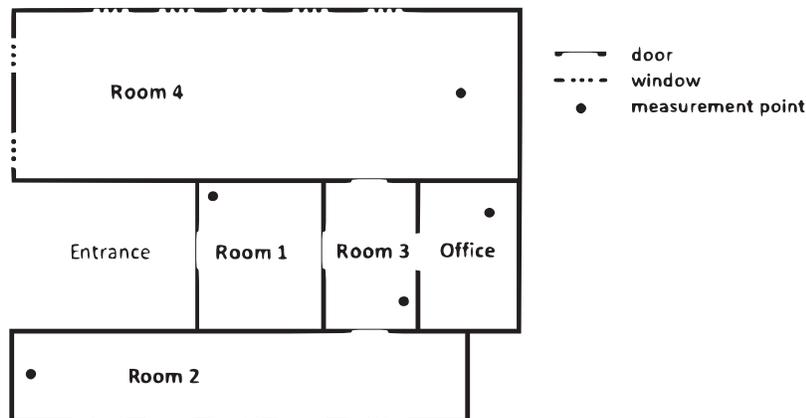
Plan of the Physics Museum (not to scale). It shows the arrangement of the rooms marking the localisation of doors, windows and measurement points.
